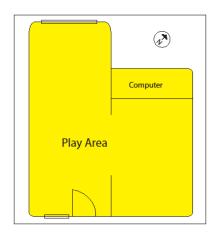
Jeff Gordon Children's Teen Room Plan. Not to scale.
